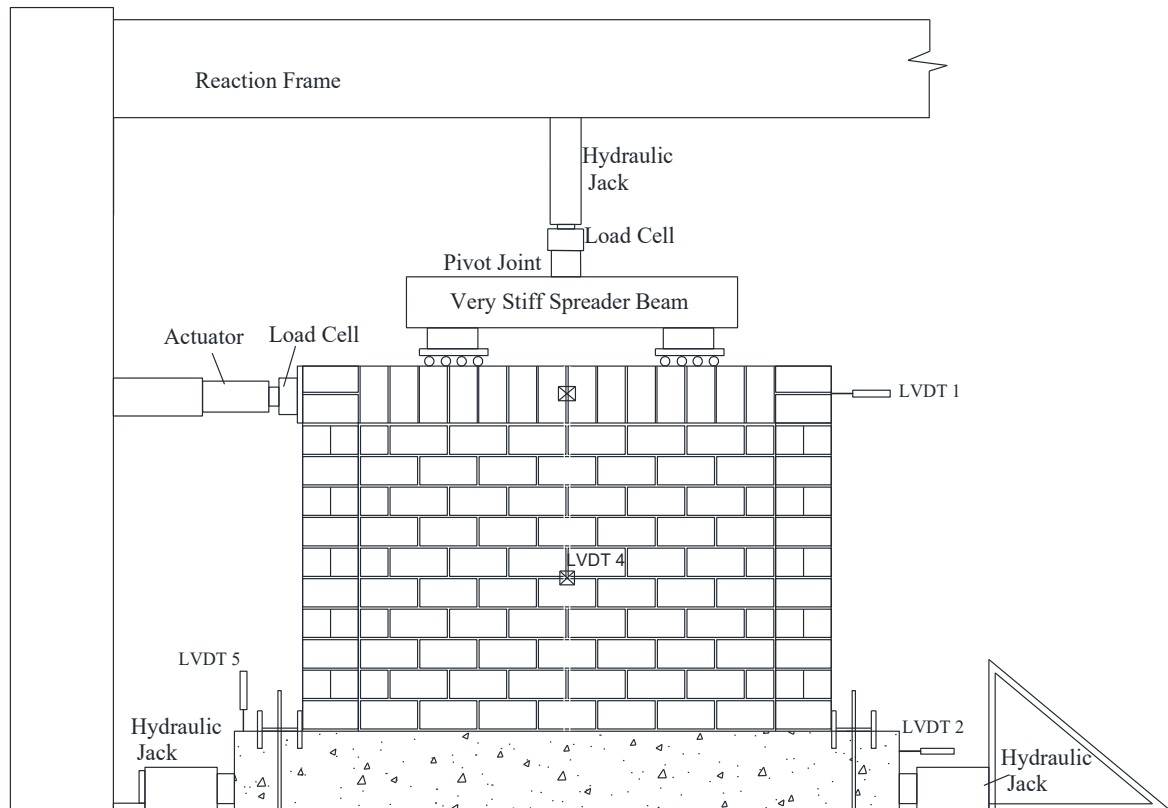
Schematic of Vertical and Lateral Loading Test Setup
